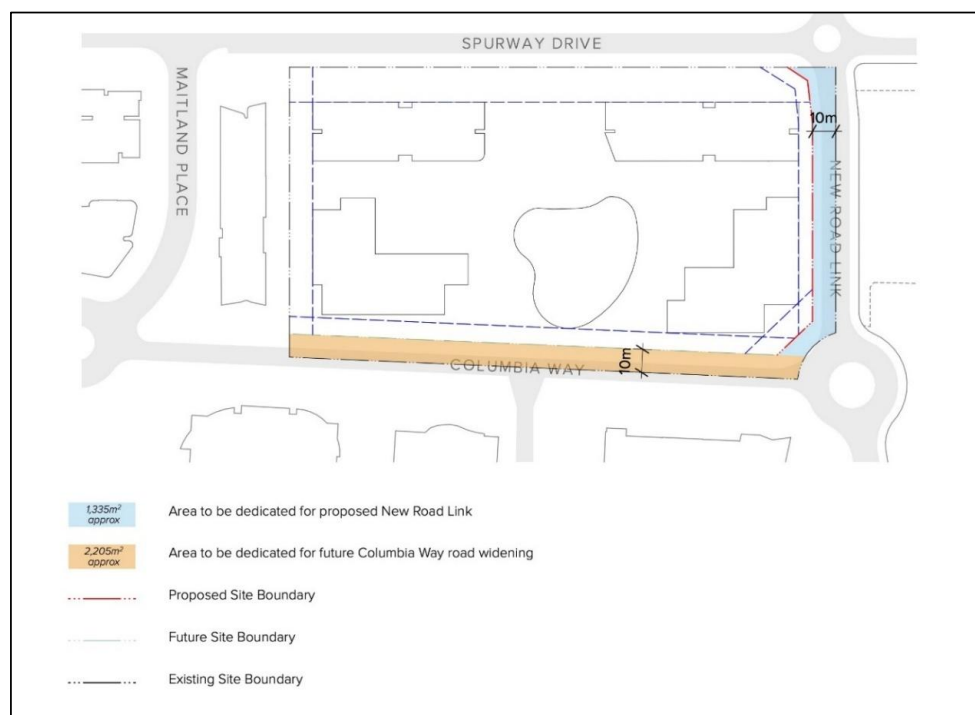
Road widening and dedication of land to Council – 7-15 Columbia Way
